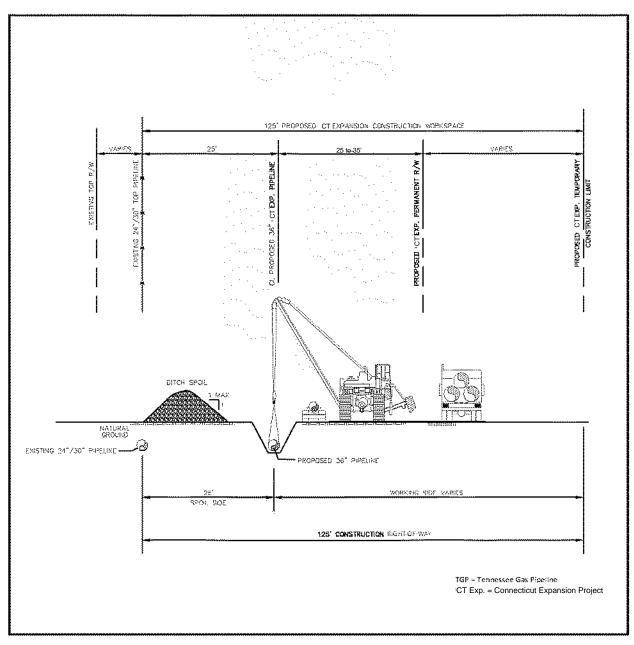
Typical Construction Right-of-Way for 36-inch-diameter Pipeline
